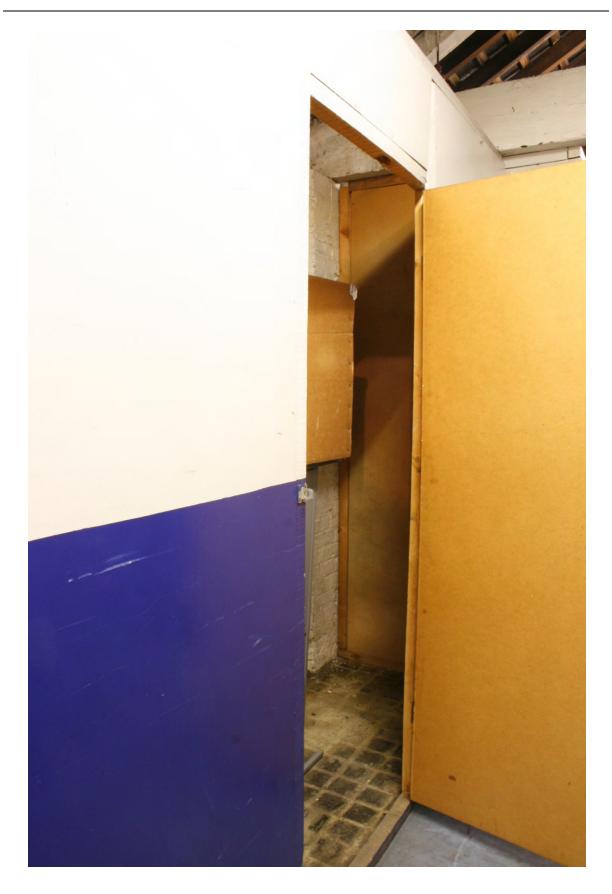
Original cobbling within a small storage space area on the first floor, looking north (72FmLa D100 062a)
